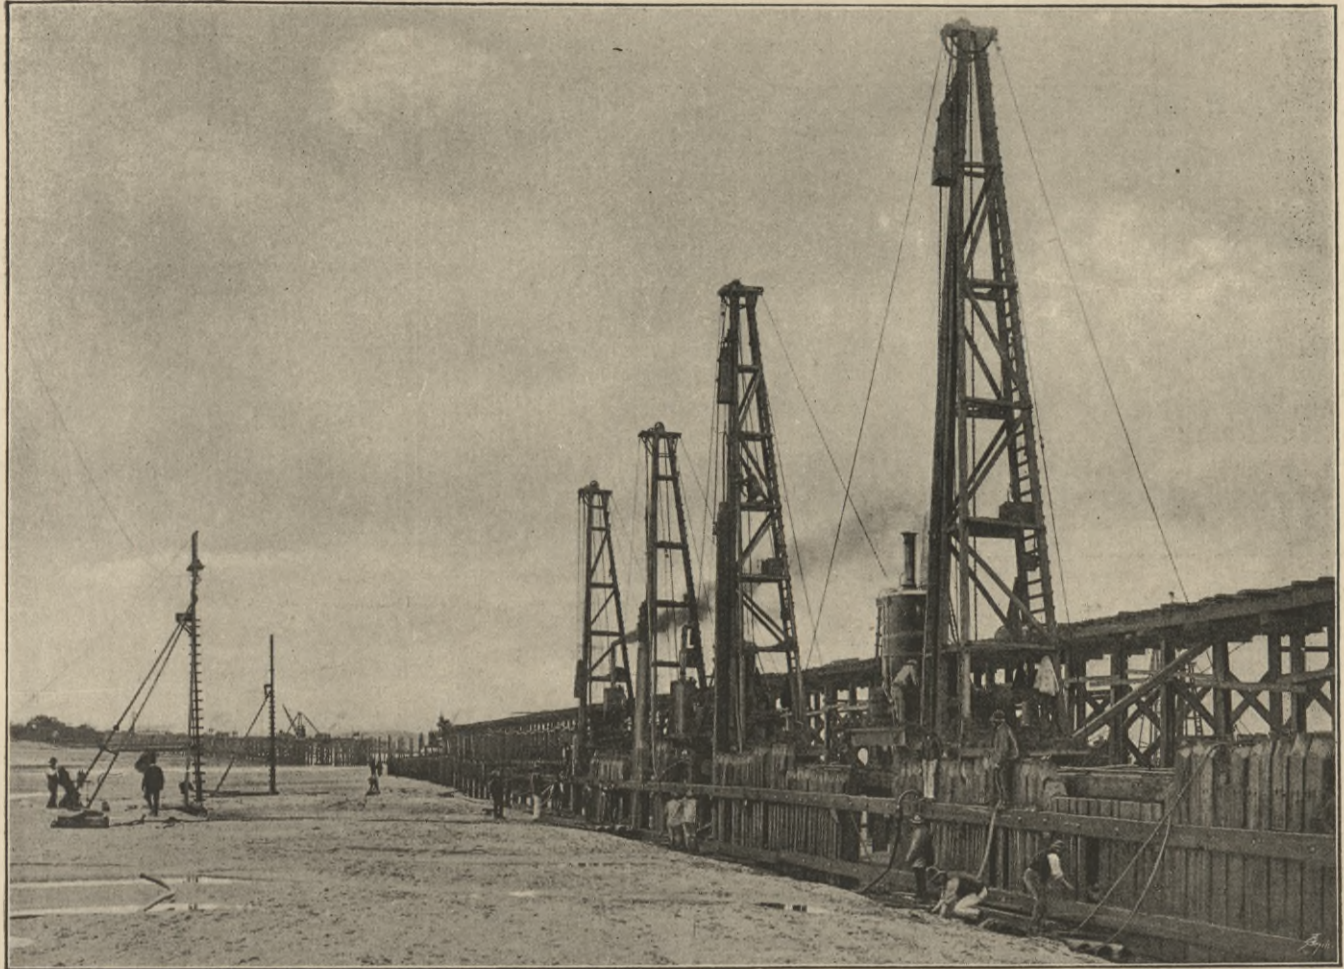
ELLESMERE PORT, LOOKING TOWARDS EASTHAM. (See Page 35.)
